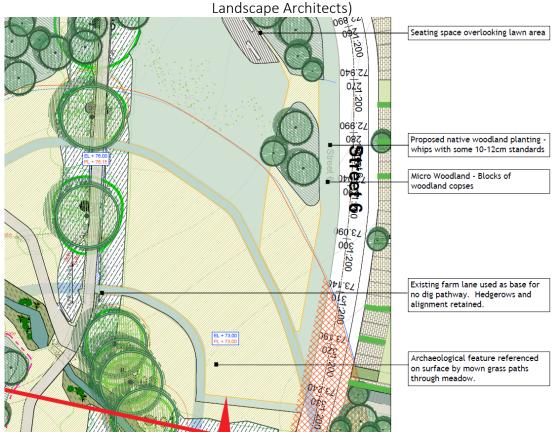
AA1 showing stream treatment and planting detail (Source: KFLA
